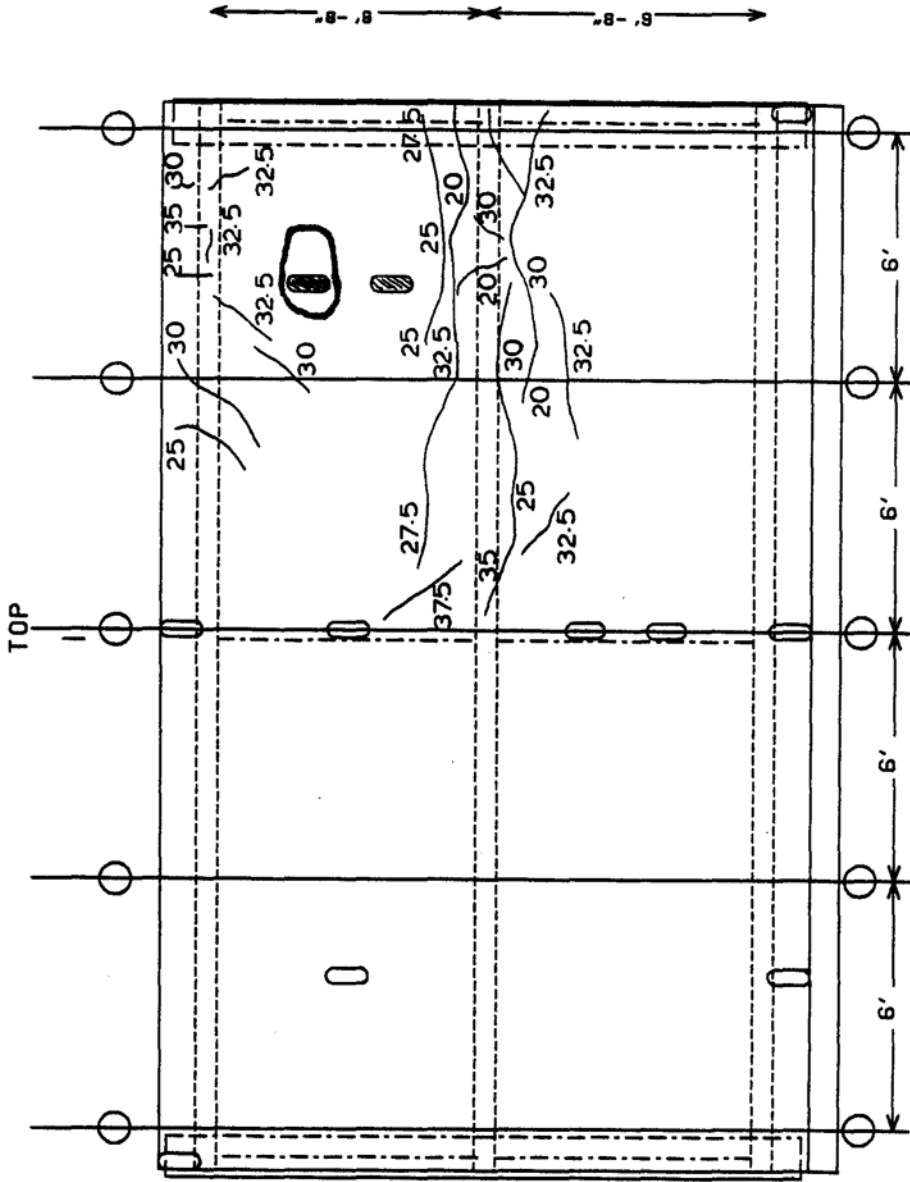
Top Cracking Pattern (First Bridge - Test No. 5)
